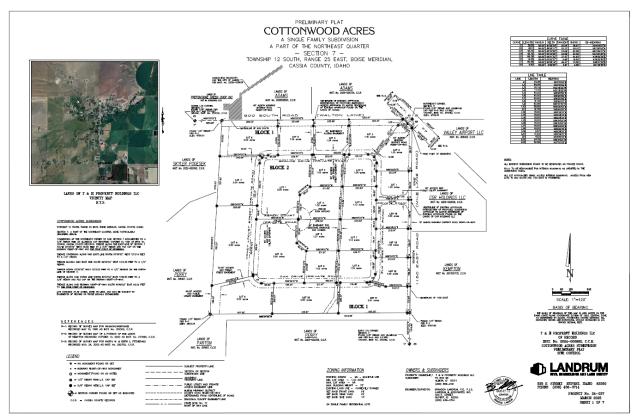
COTTONWOOD ACRES PRELIMINARY PLAT
